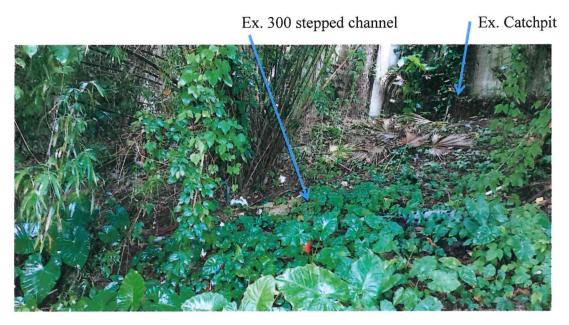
Photo showing the existing 300 stepped channel and catchpit
